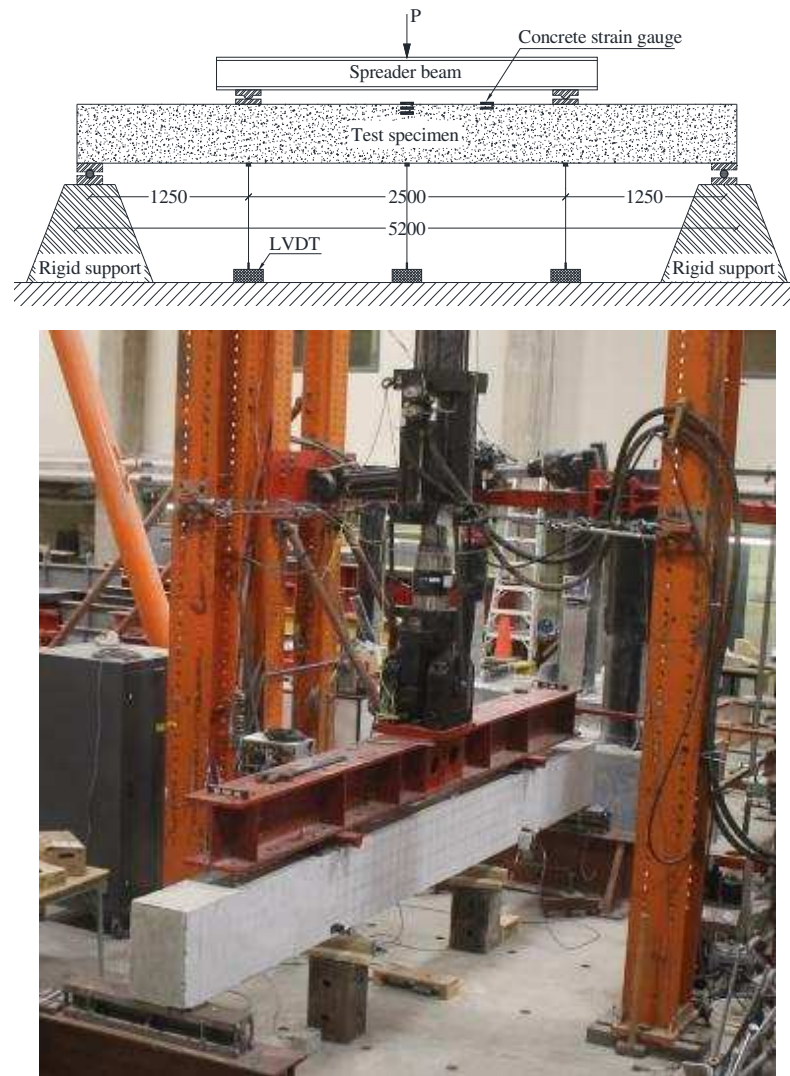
Details of test setup, and location of LVDTs and concrete strain gauges (All dimensions are in mm; 1 mm=0.0394 in.)
